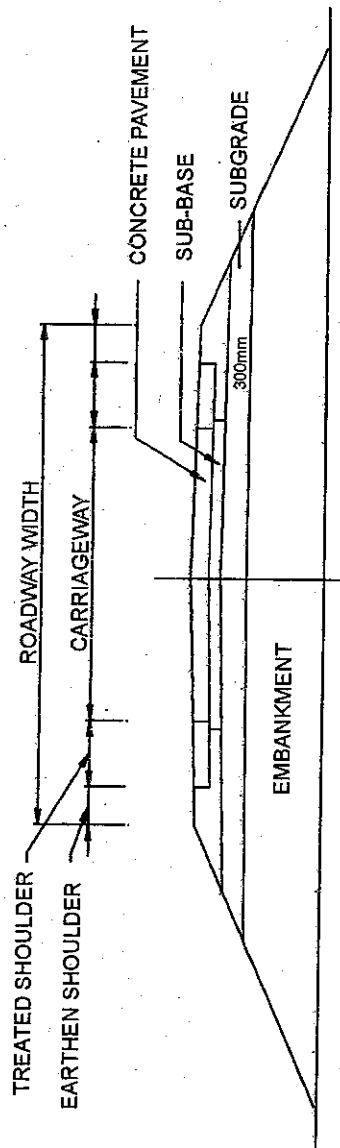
Terms used in the Specifications to describe road cross-section elements with a cement concrete pavement
